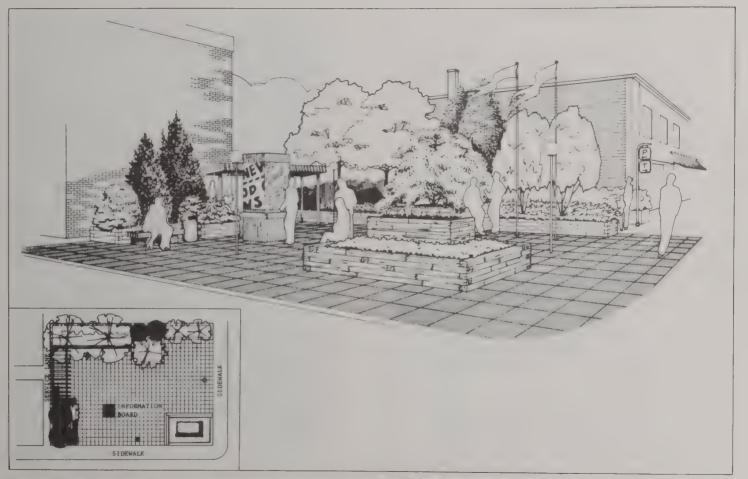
A street corner parkette emphasizes pedestrian amenities information, seating, shelter. The plan inset at lower left, illustrates a design plan prepared for the parkette.
